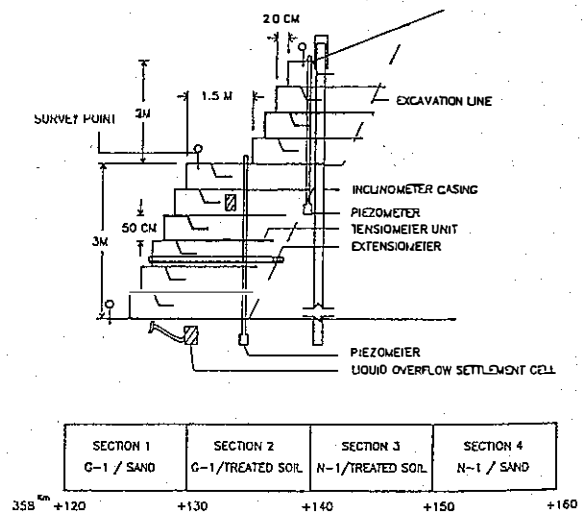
Arrangement of Instrumentation System from Typical Cross Section
